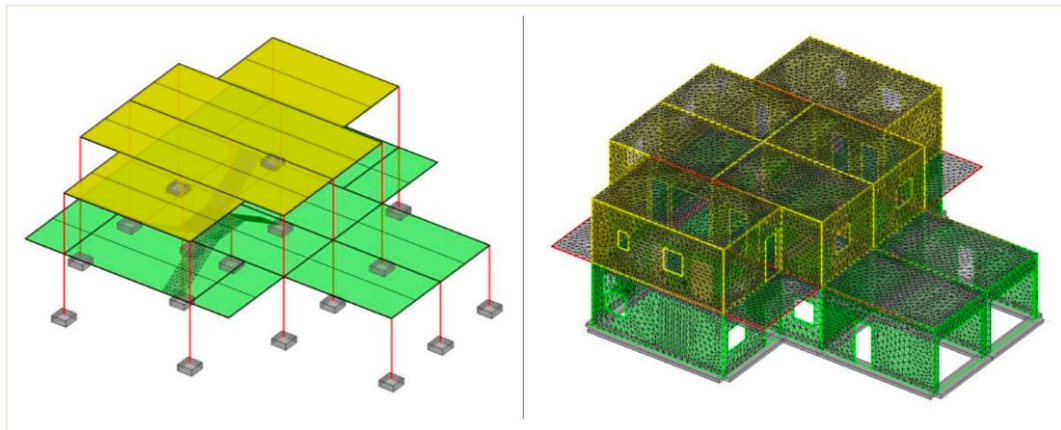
Reinforced Concrete Frame (RCF) and Steel Frame (SF) on the Left, Multi-Layer Structural Panel (MSP) application on the right (Pérez-García et al., 2014)
